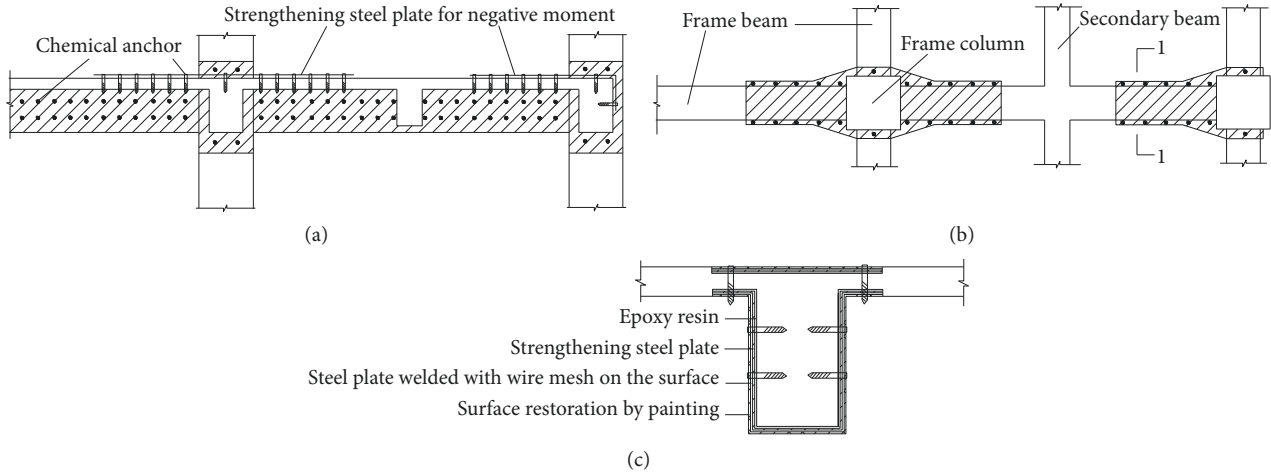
Schematic diagram of the strengthening constructional method: (a) reinforcement elevation; (b) reinforcement plane; (c) reinforcement profile (1-1 section).
